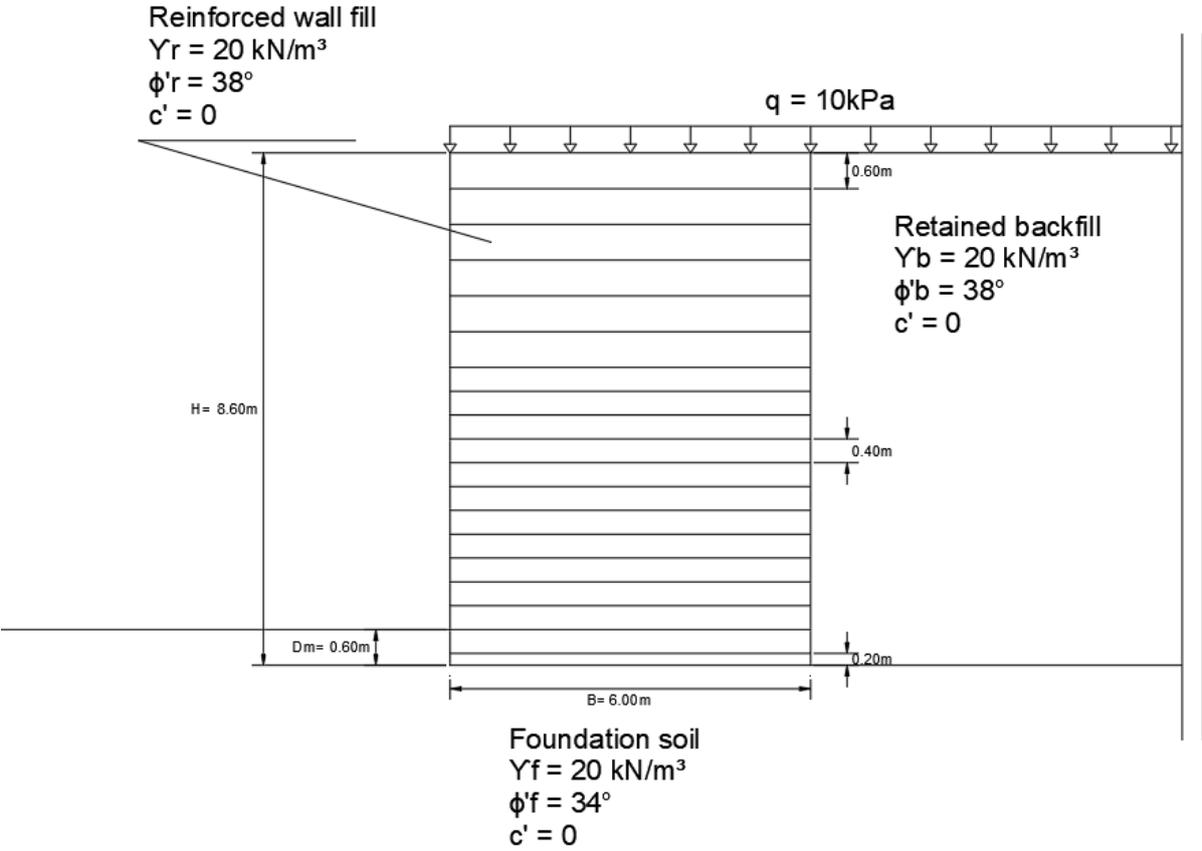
Design example of a simple reinforced soil wall with traffic surcharge
